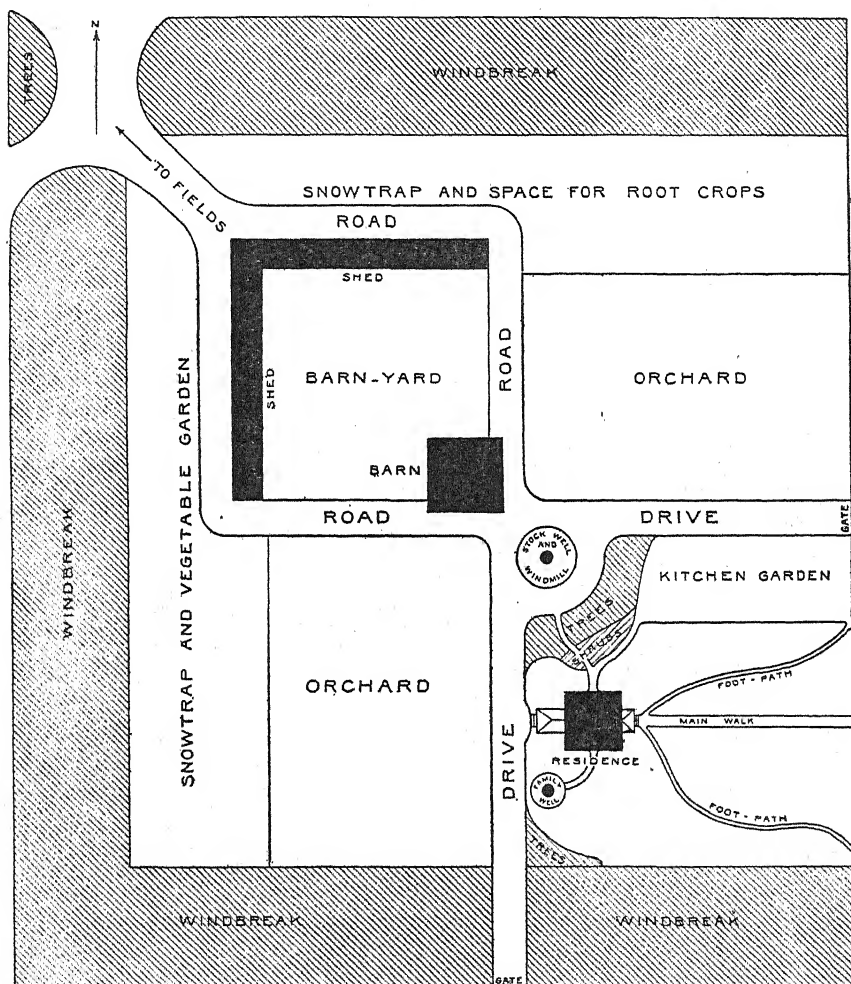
Plan of a farmstead, situated at the southeast corner of a prairie farm, arranged to afford windbreak protection to all the elements of the rural home.
